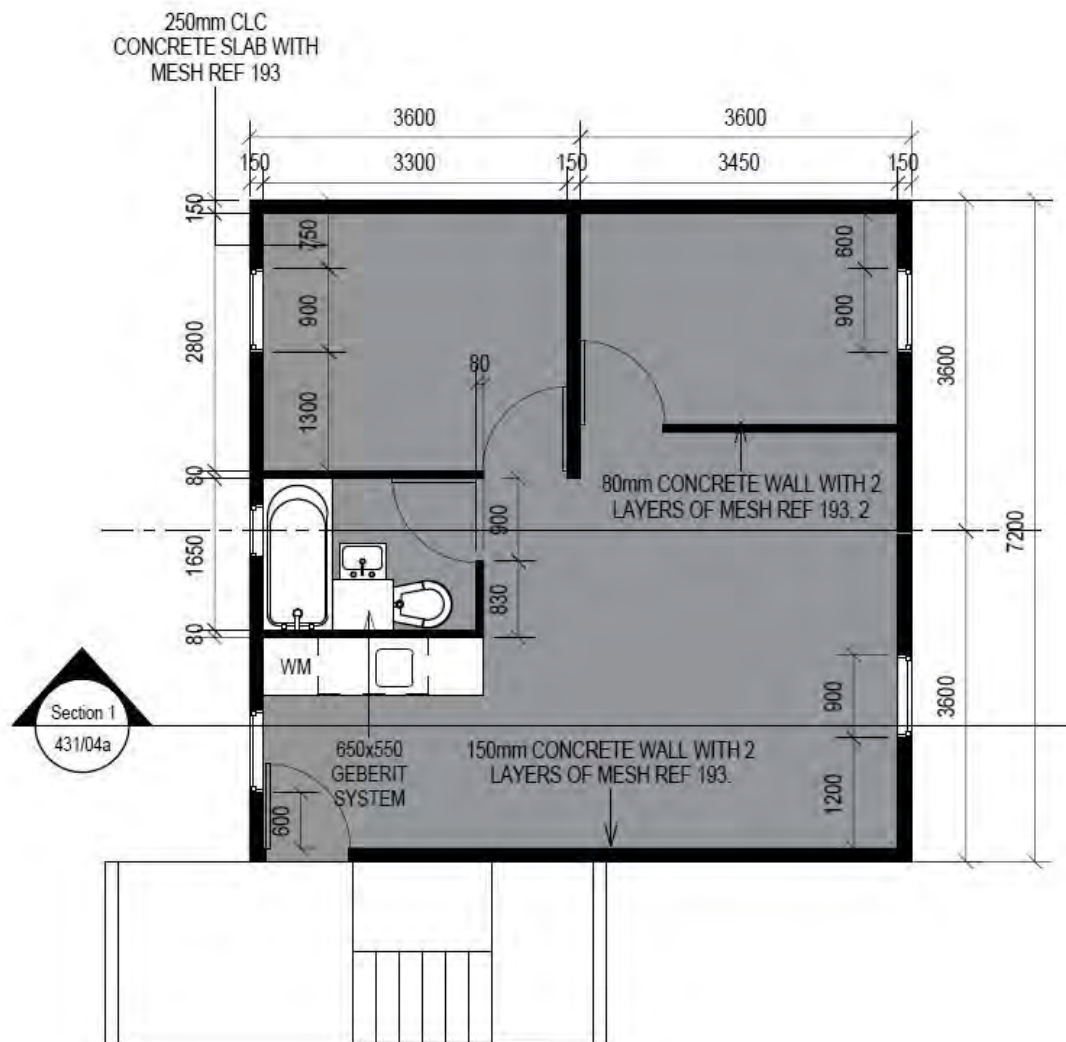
Pilot building floor plan showing layout of major walls for the second floor
